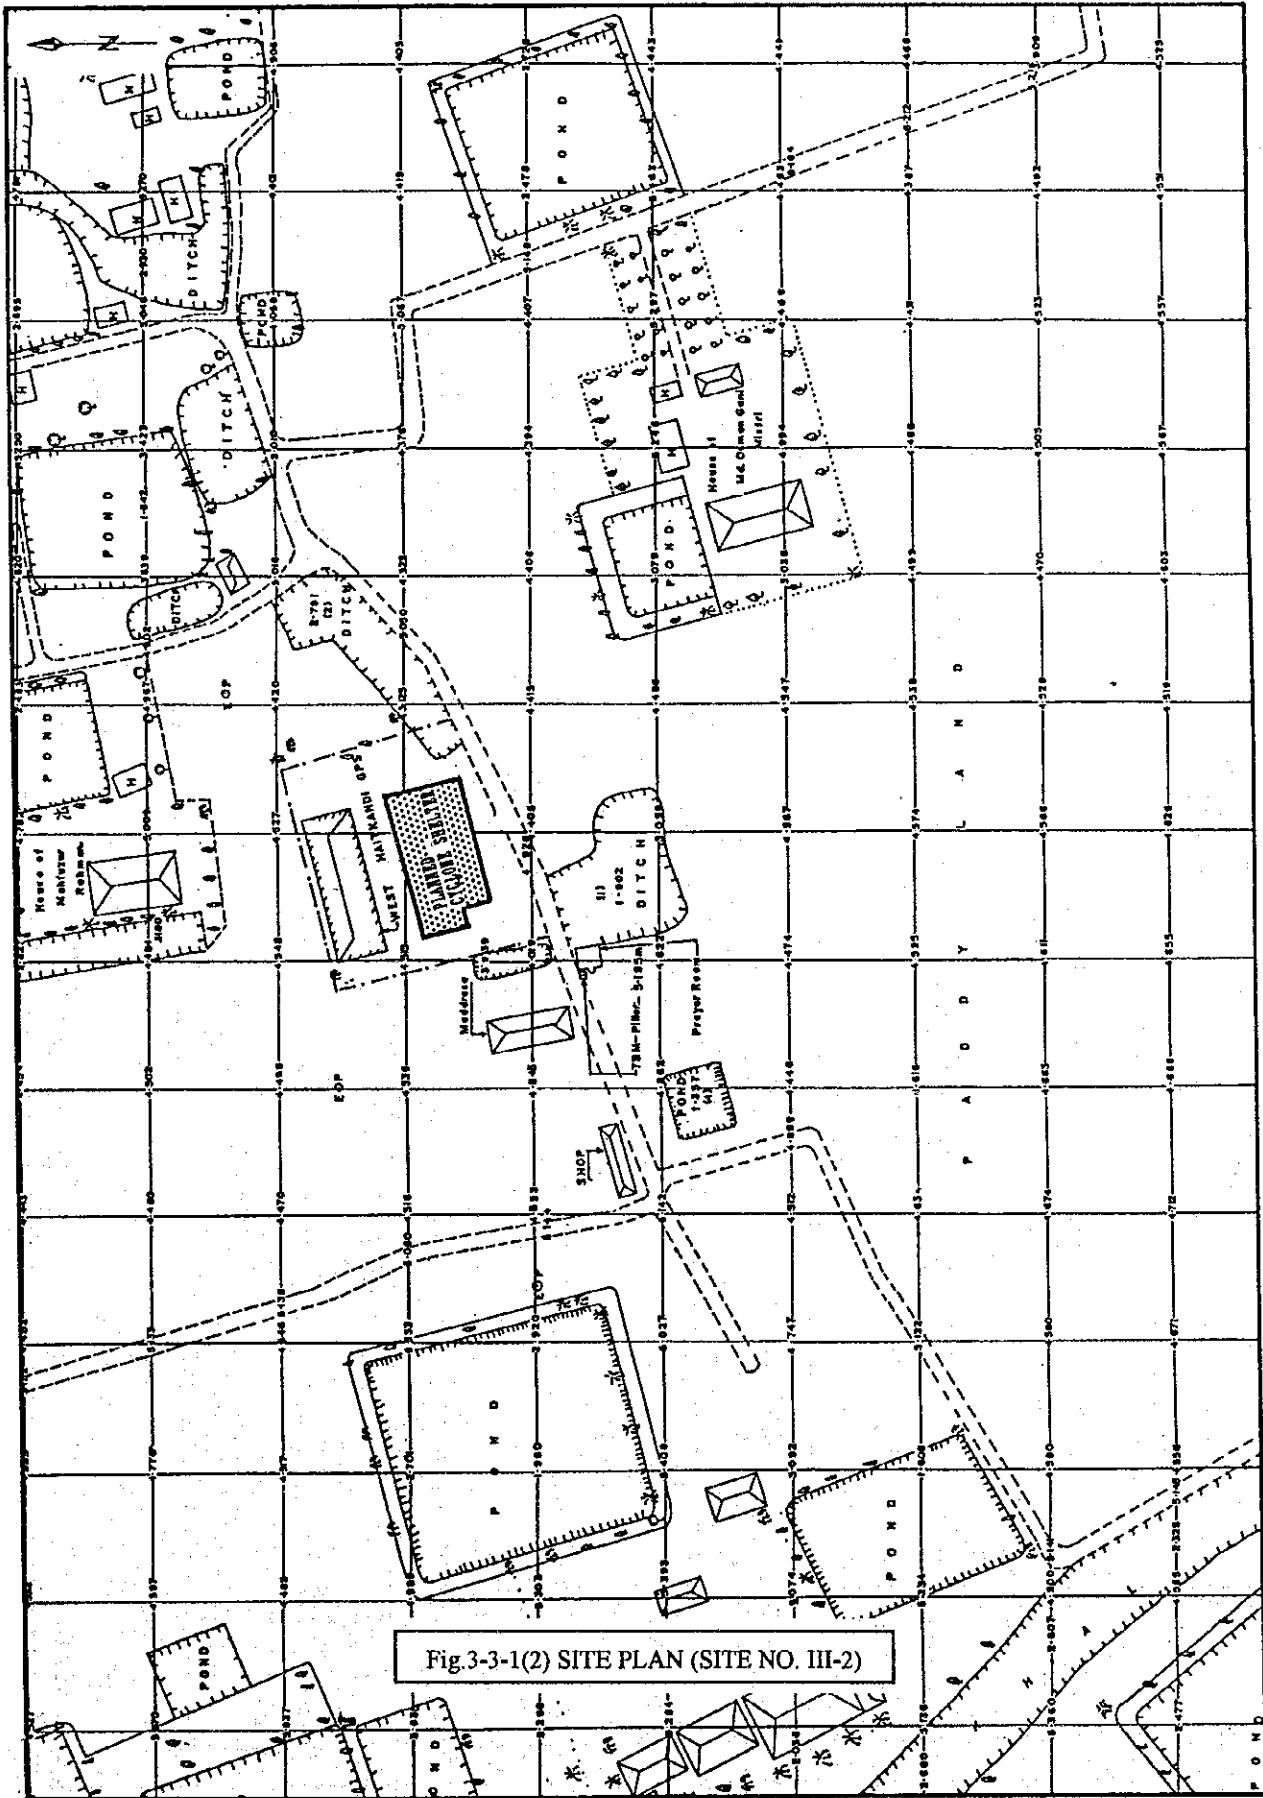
(2) SITE PLAN (SITE NO. III-2)
